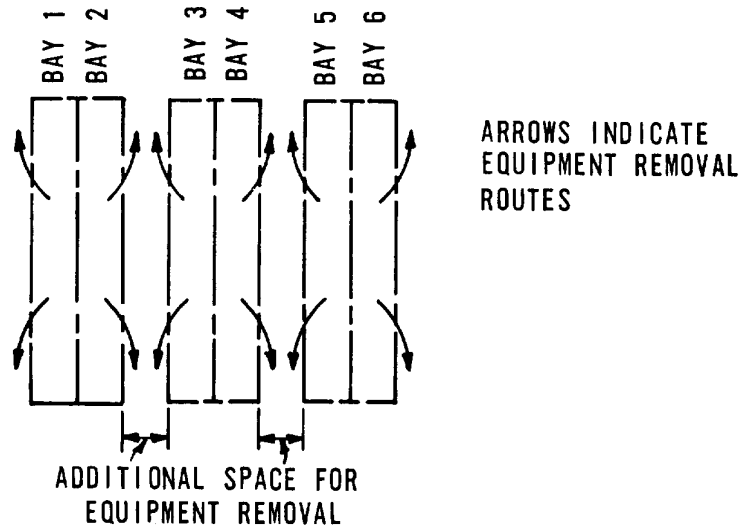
SUBSTATION PLAN VIEW SHOWING
